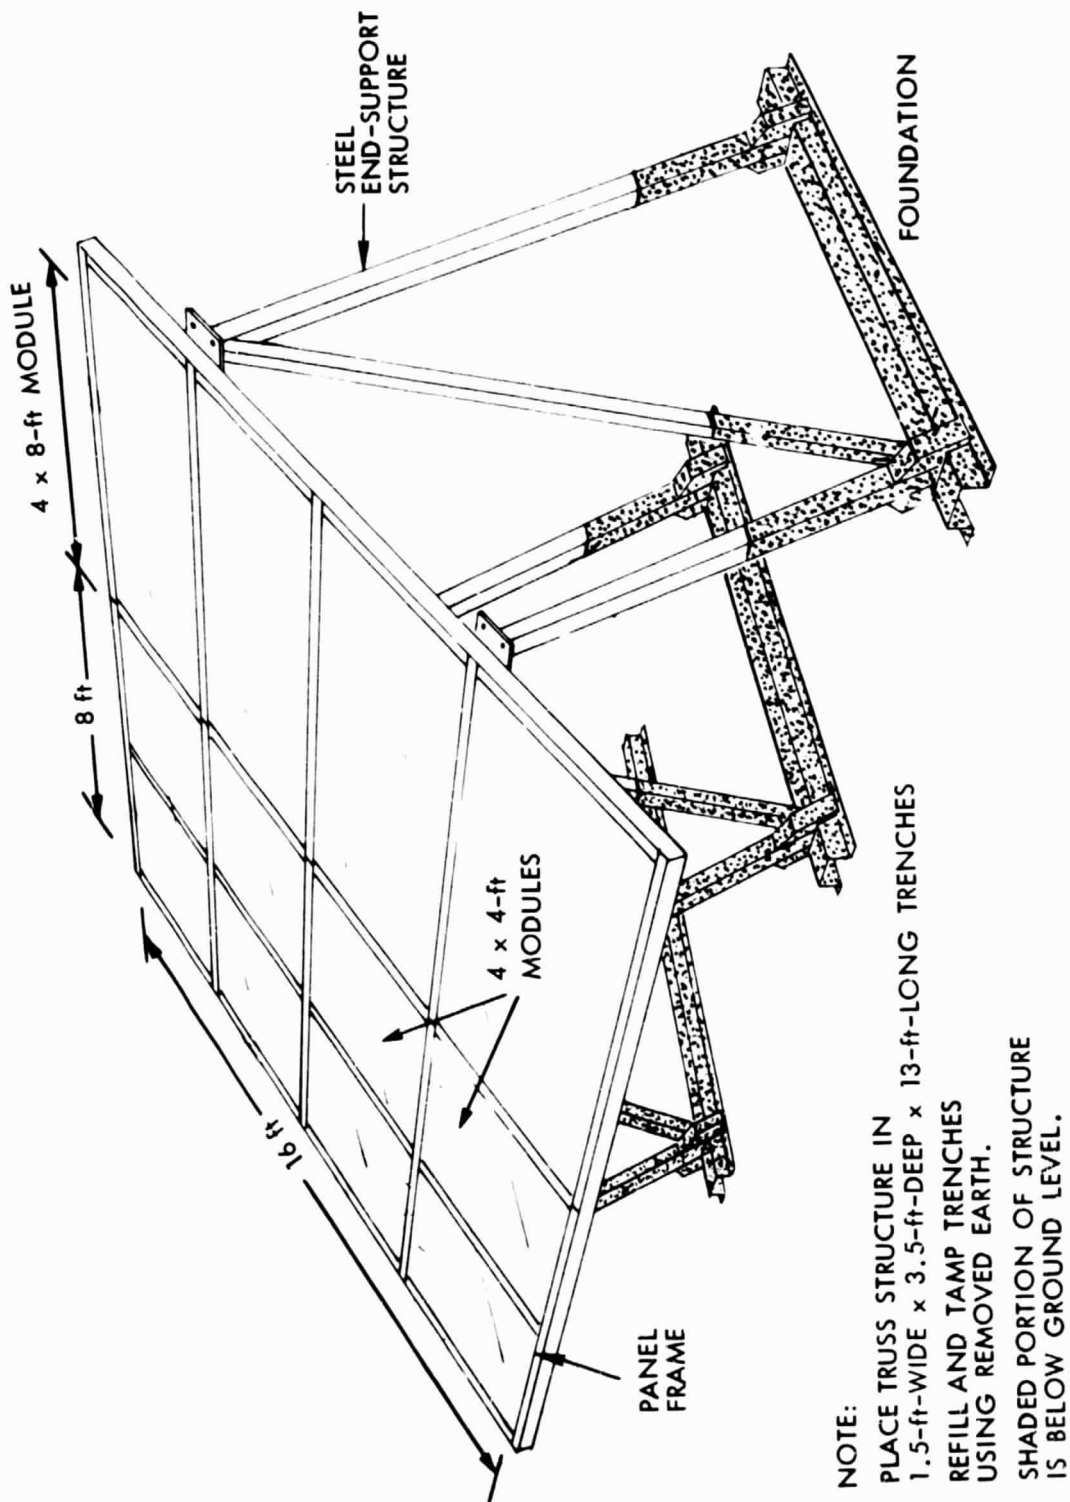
Solar Array Structure Based on Buried Steel Trusses and 16-ft-High x 8-ft-Wide Panel Frames
